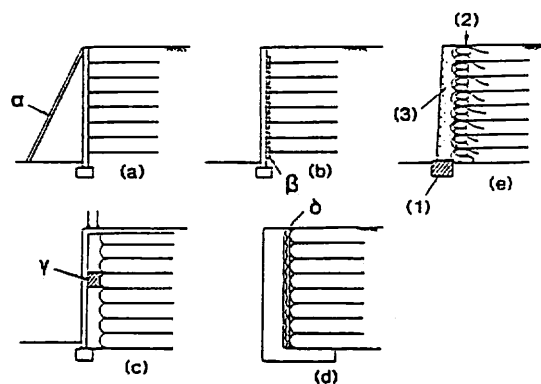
Several methods using a continuous rigid facing: (a) Fixed type facing fully propped during filling and compacting the backfill, (b) the use of sliders for a facing fully propped during filling and compacting the backfill, (c) separated type facing, (d) the use of a compressible layer placed on the rear of facing fully propped during constructing the backfill, and (e) stage construction (the numbers mean the construction sequences).
